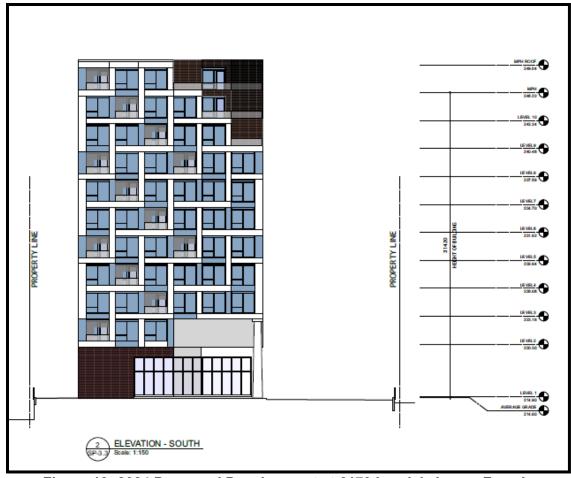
2024 Proposed Development at 6179 Lundy's Lane - Façade (CY Lee Architects Inc. 2024a)
